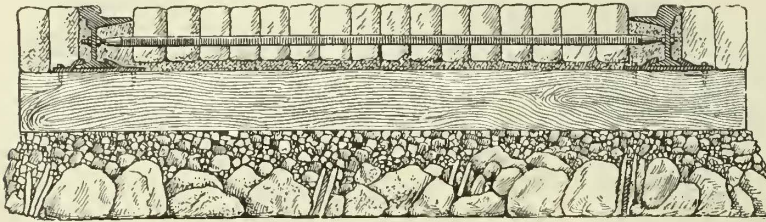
CROSS SECTION OF TRACK ON BALLAST FOUNDATION—GIRDER RAIL SPIKED TO TIES.
